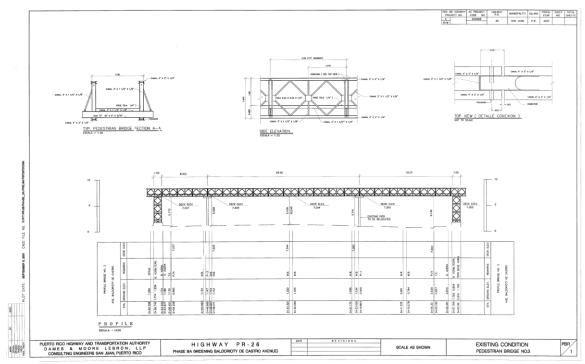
Bridge Drawings 2001 – Sheet 1
